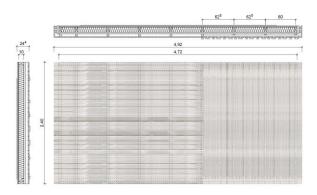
Dimensions of the produced timber facade panel, wood chip insulation, U-value= 0.29 W/(m²*k)
